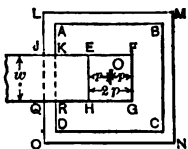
Square Supporting Area. Isolated Load on End of Wall
